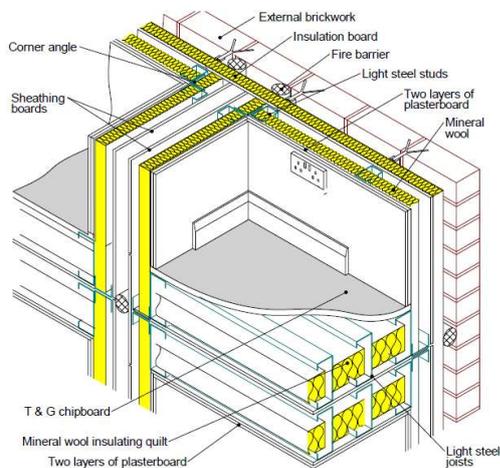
Fire safety measures in wall and floor structure (Lawson, 2007).
